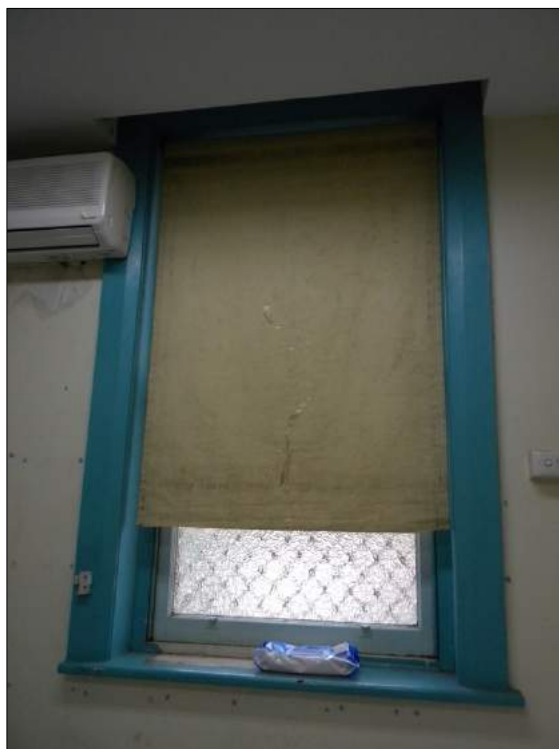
Southern wall in the above office. This appears to be a later wall and door.
